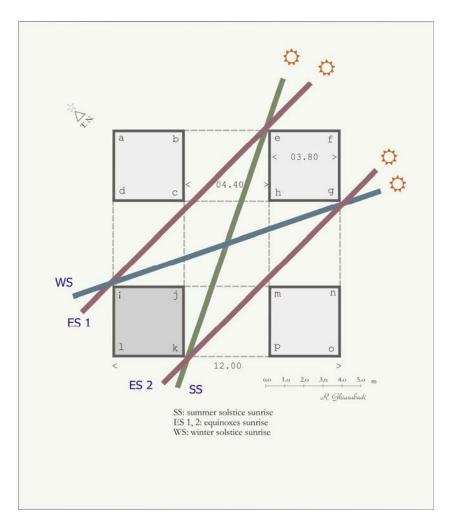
The floor plan and sightlines of Khworabad Tetrapylon
